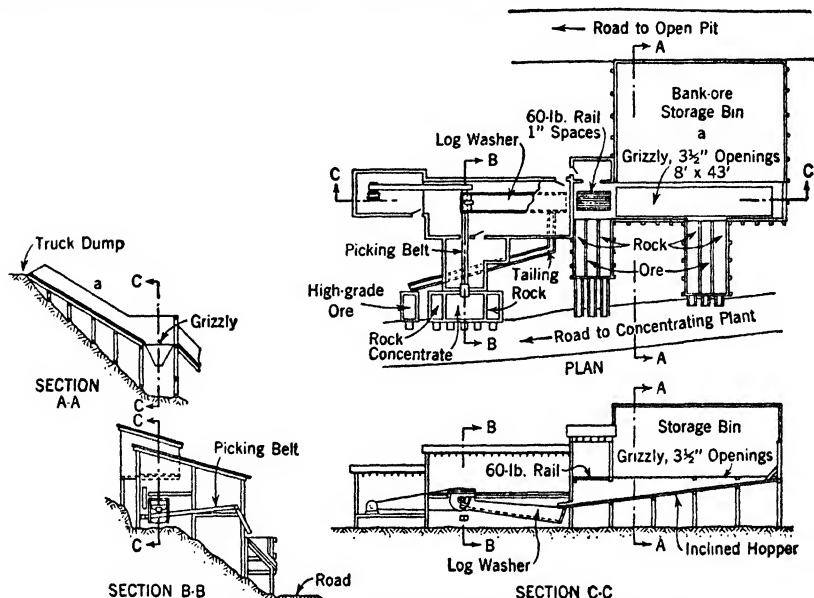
General arrangement of washing plant, EMBREE IRON ORE CO.
